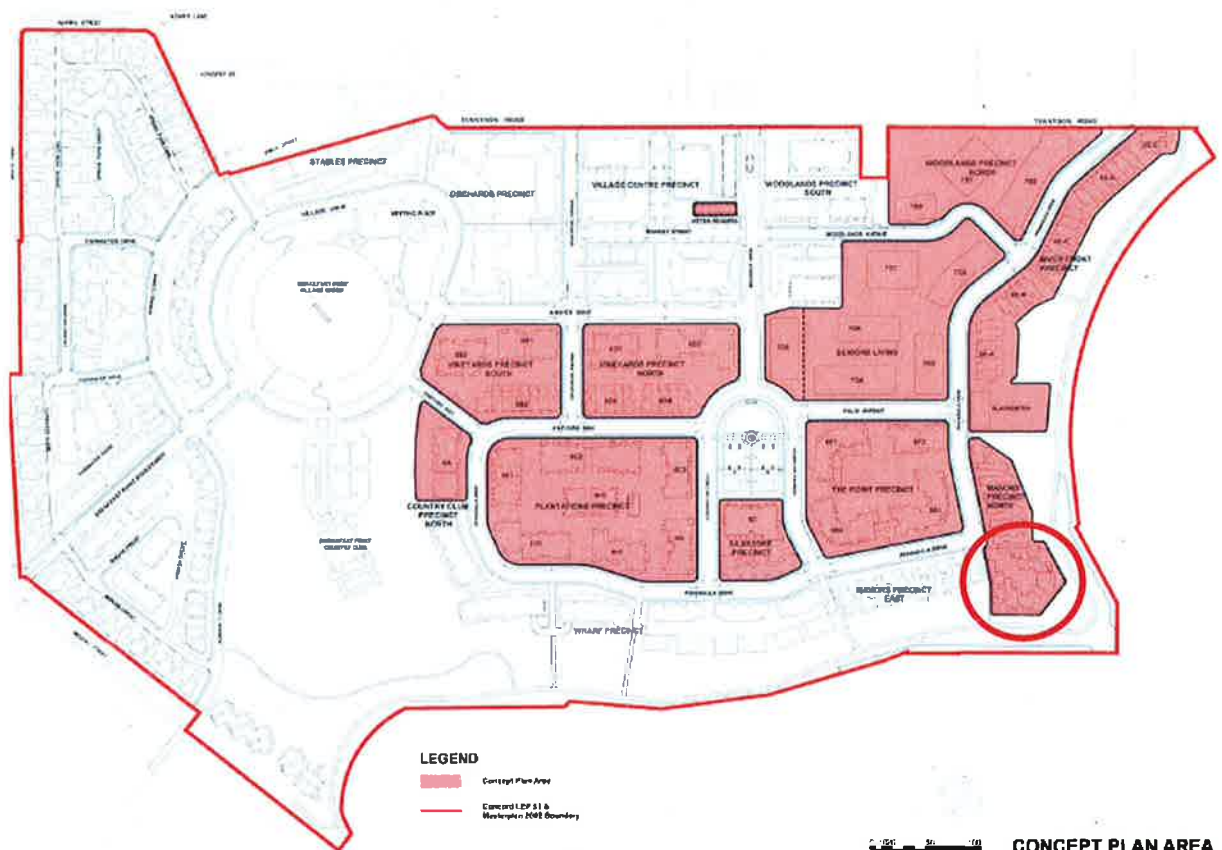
Proposed amended Concept Plan with location of proposed dwellings in place of the Power House building (Power House site circled in red).
